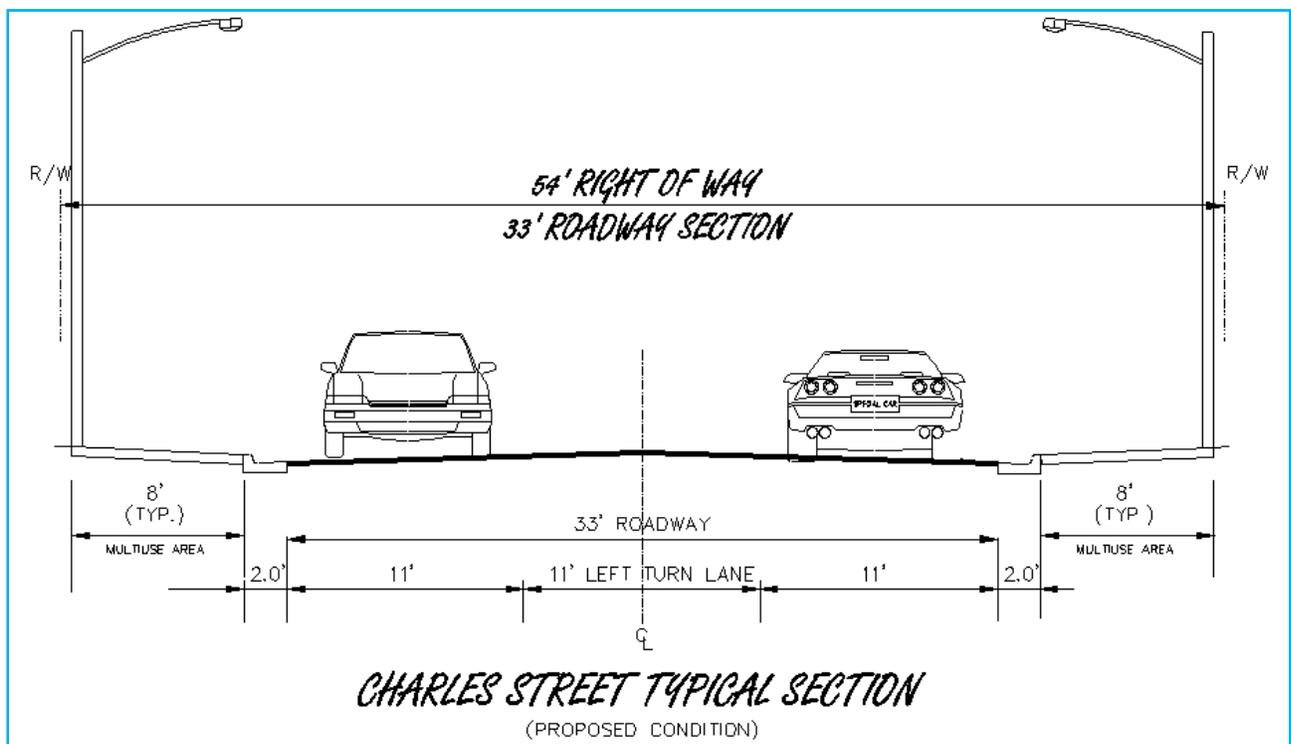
PROPOSED CHARLES STREET - DOWNTOWN SECTION
